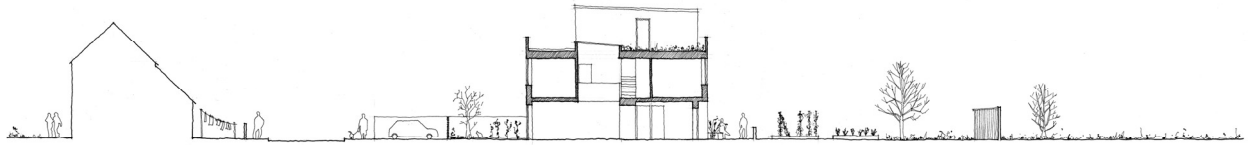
Section through 4 bed house type 1:500; Fig. 6.70 North elevation 1:500; Fig. 6.71 South elevation 1:500
